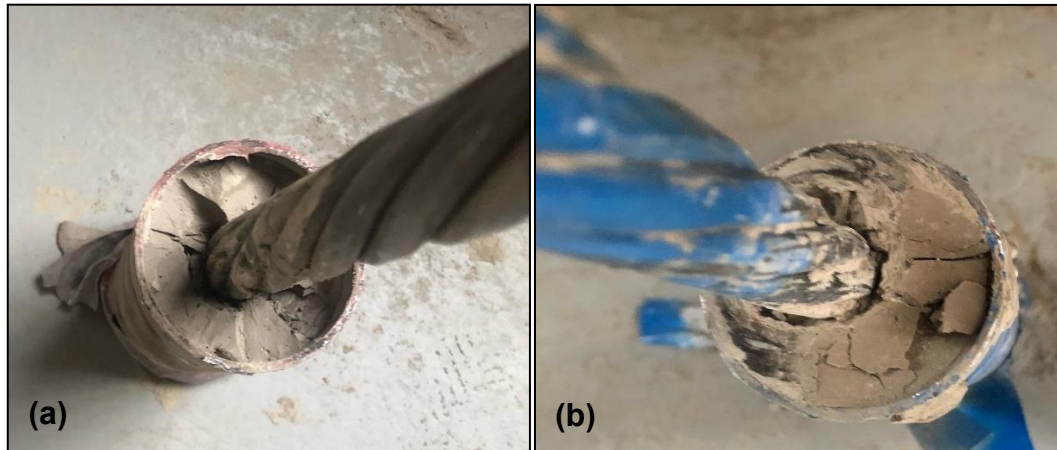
Pictures showing the failure of the grout column during short encapsulation pull-out testing of grout test samples, (a) Grout B fair-quality mixture sample, and (b) Grout A good-quality mixture sample.
